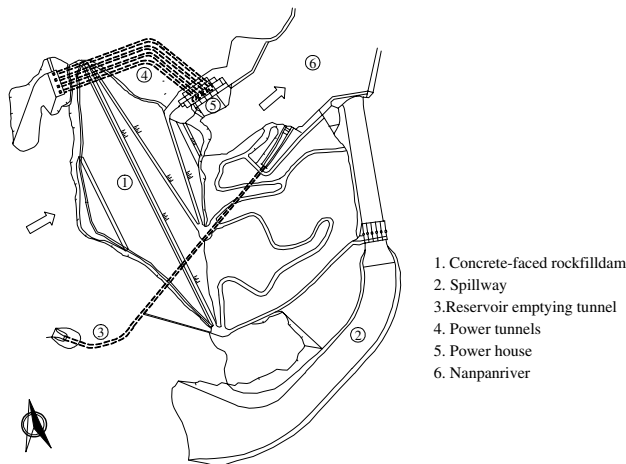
Project layout of Tianshengqiao-I concrete-faced rockfill dam.
